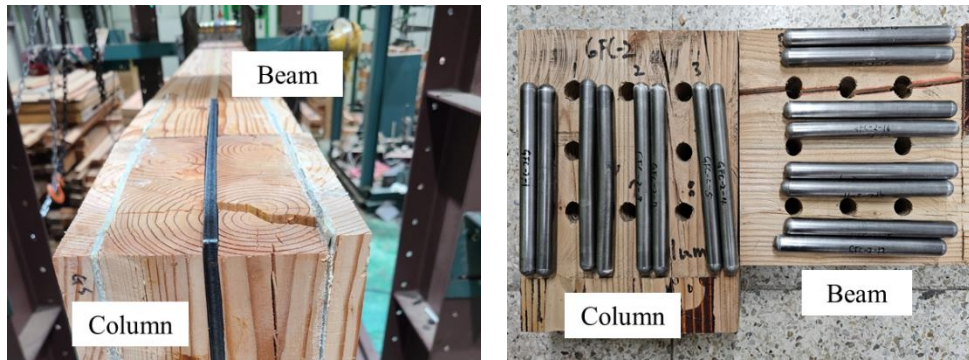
Failure modes of laminated timber frame GFC
